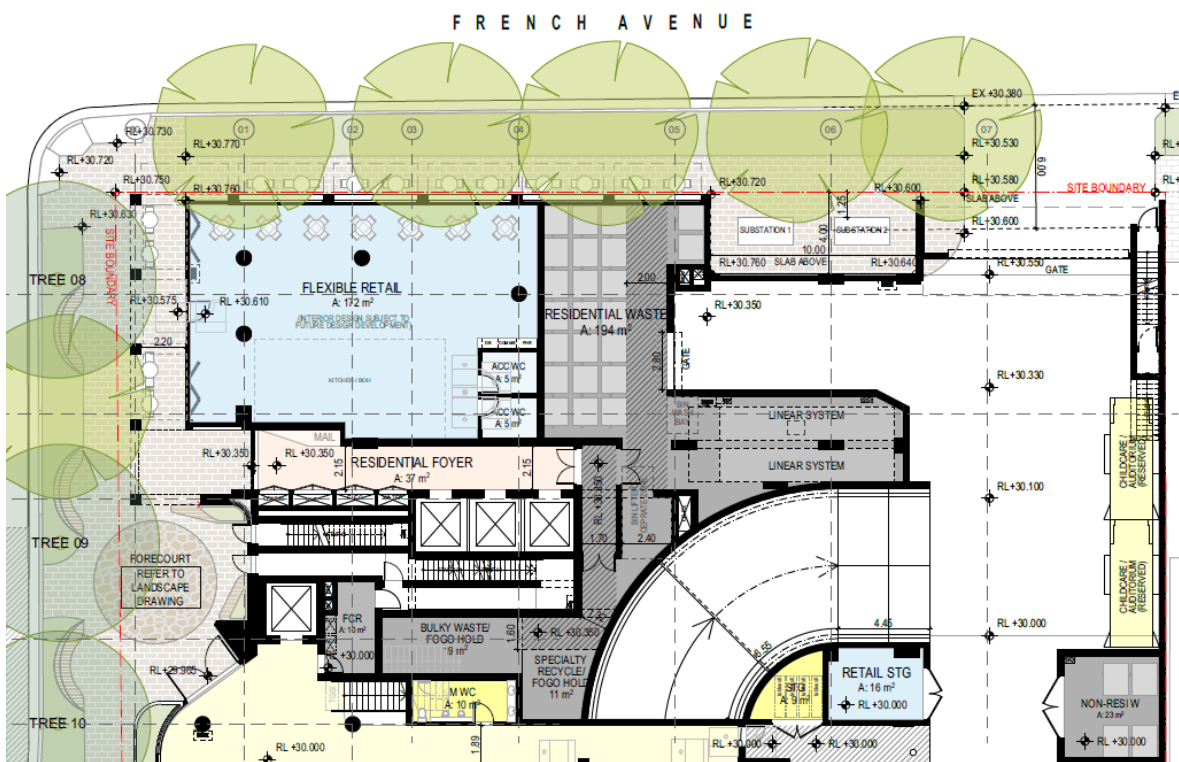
Floor plan of proposed residential and non-residential waste areas (shaded in grey)
